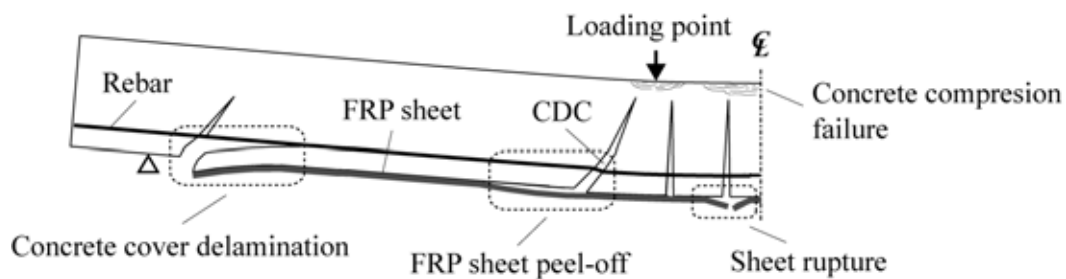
Schematic diagram for failure modes of beams reinforced with FRP sheet
